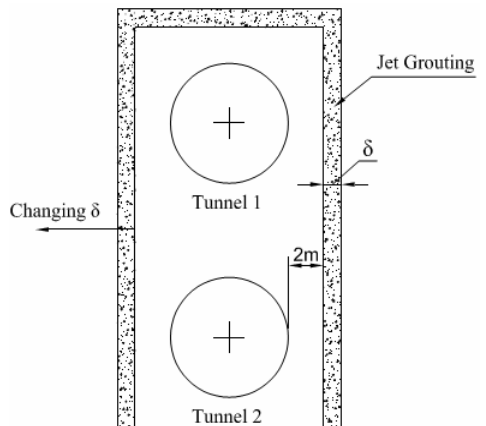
Alternative using mortar of Jet Grouting at Km0 + 900 on the Metro
